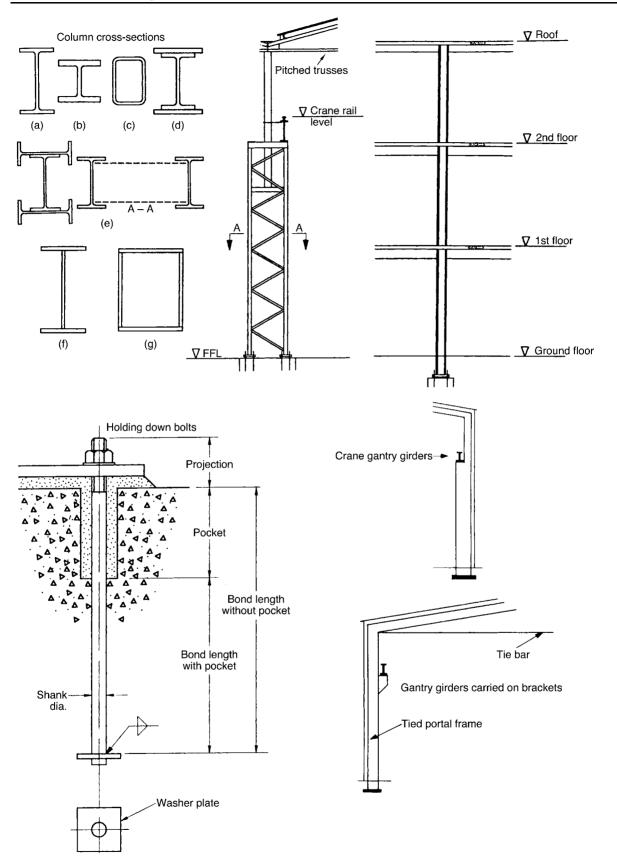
Types of column, holding down bolts and gantry girders (BS 5950 specification)
